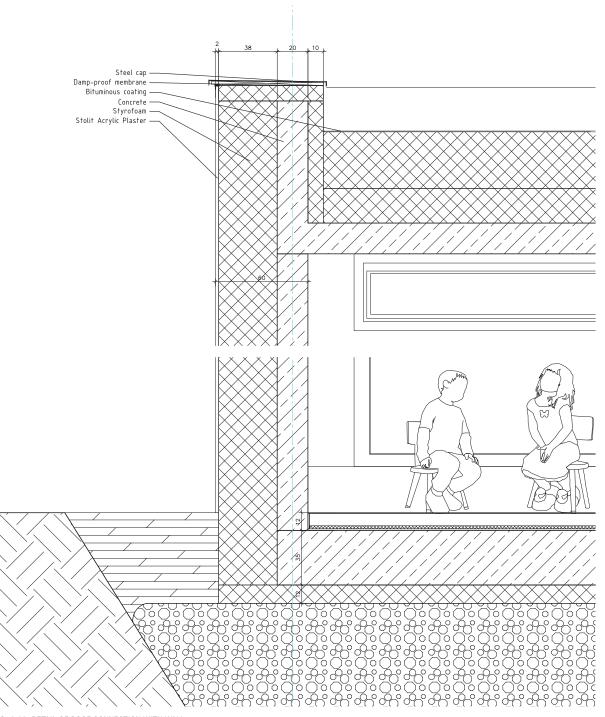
DETAIL OF ROOF CONNECTION WITH WALL.
